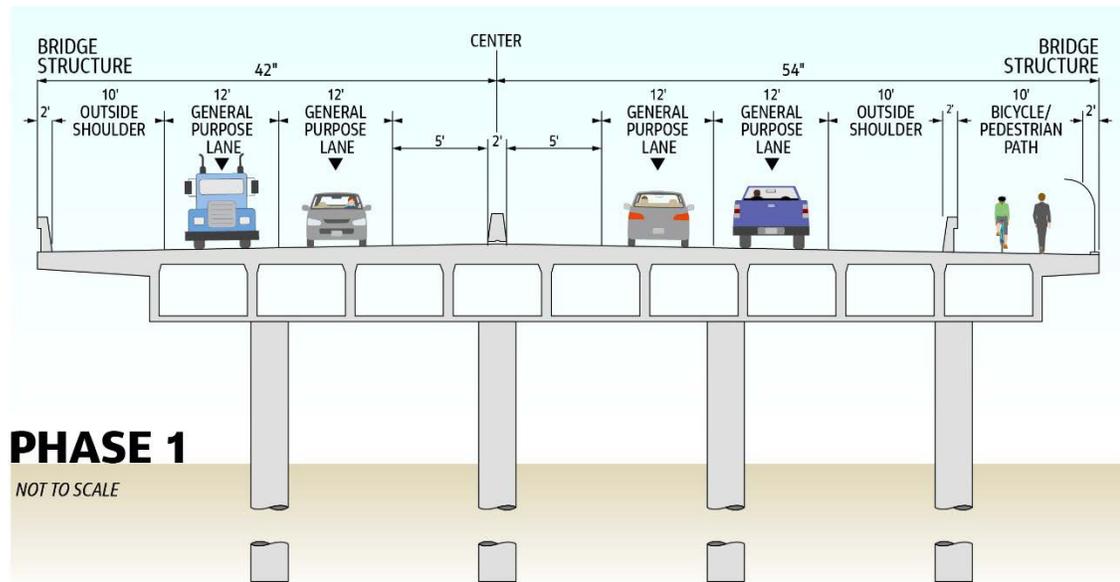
Conceptual Cross Section of the Proposed Novato Creek Bridge
